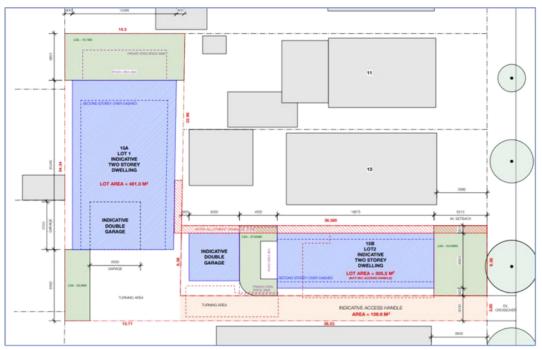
Proposed Lot Sizes and Indicative Building Footprints.
